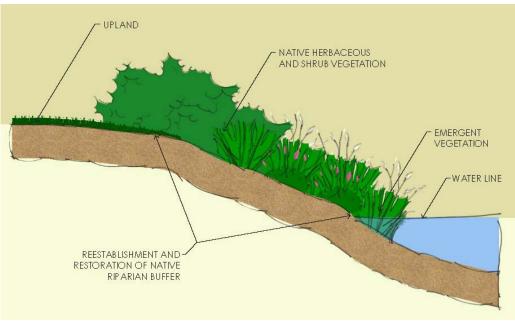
Typical Bank Restoration Planting for Small Streams
